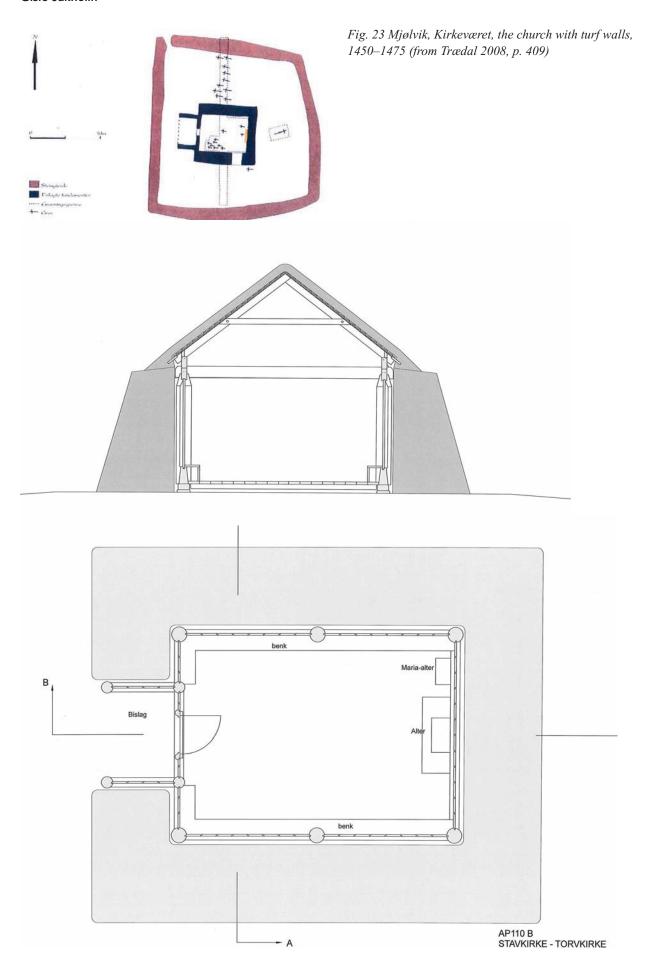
a-b Trondenes Almenningr, stave church with turf walls, reconstruction, 2016 (Gisle Jakhelln)
